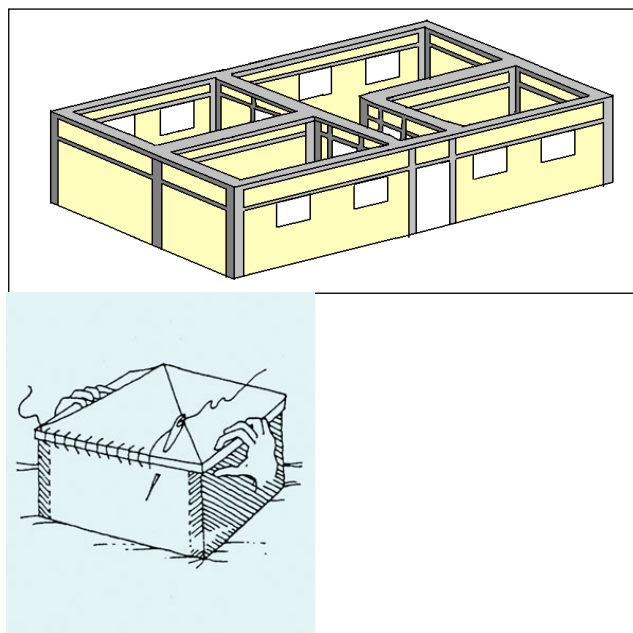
Box-Behavior. Horizontal and Vertical Lintels Locations in a Masonry Building
